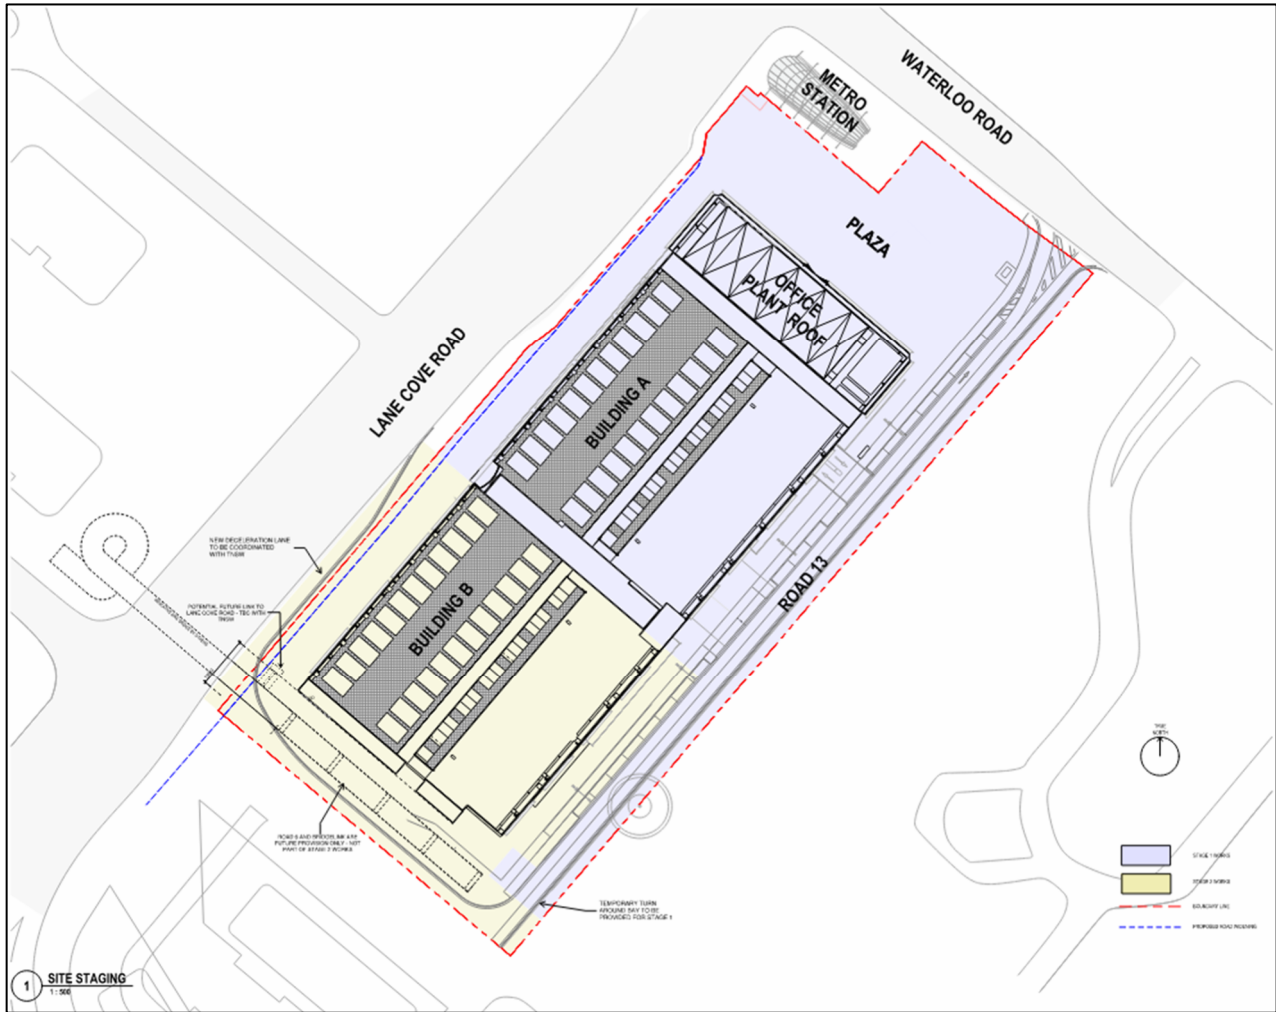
Site Staging Plan (Source: HDR Architecture dated: 16/09/2025)
